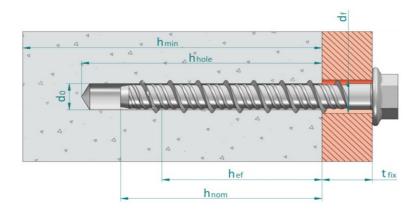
SUP-R-BOLT CONCRETE SCREW ANCHOR INSTALLATION
